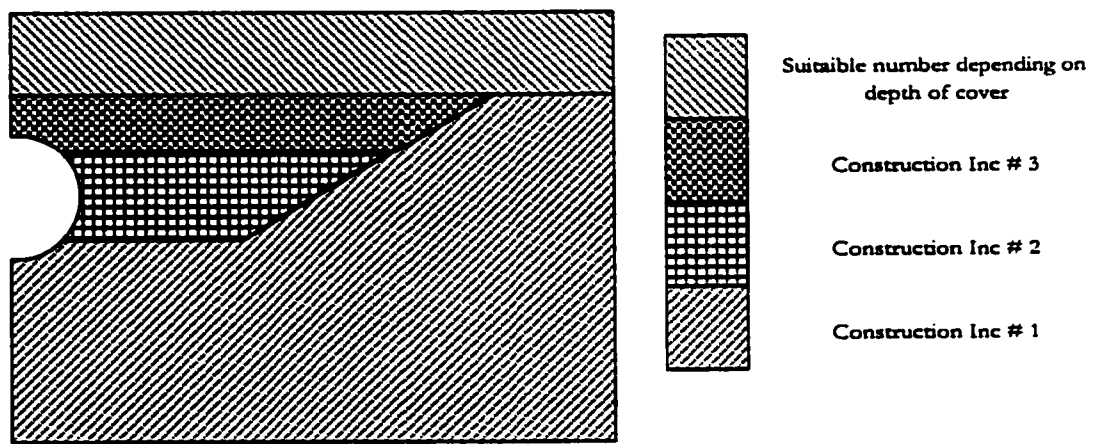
Construction increment sequence for trench type of installation used in test runs
